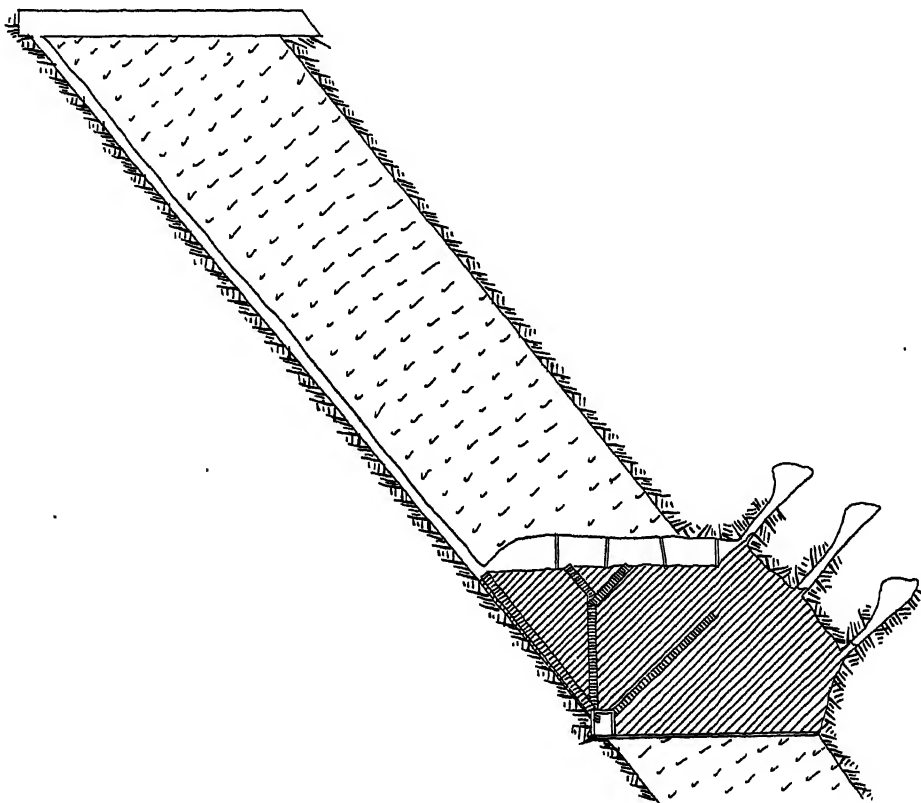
SECTION OF BECKER STOPE; STULLED AND FILLED.
